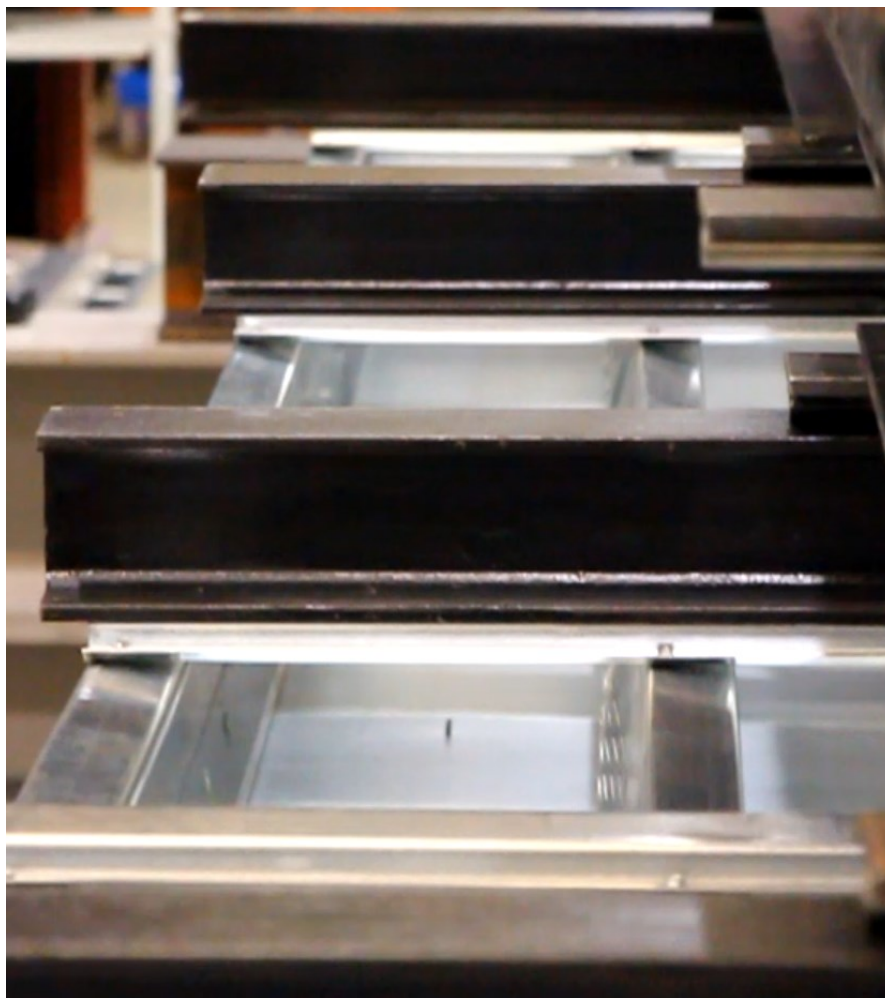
Distortional buckling half-wave length of top flange depending on fastener position in top flange. From the left test specimen 5.4M-B2 and 7.2M-B2 after failure.
